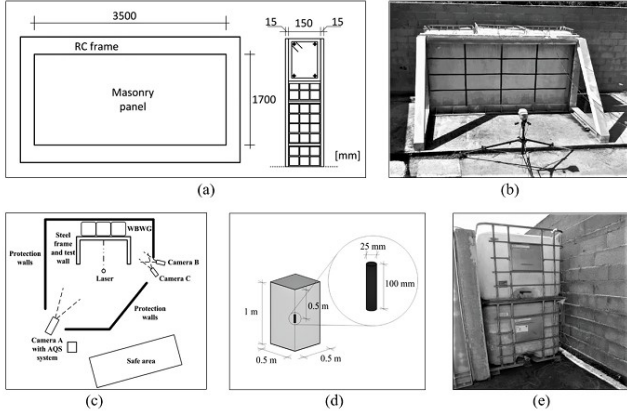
Test setup [17]: (a) Description of wall, (b) Supported steel structure and wall, (c) Layout of test setup, (d) Description of explosive charge, and (e) Water containers
